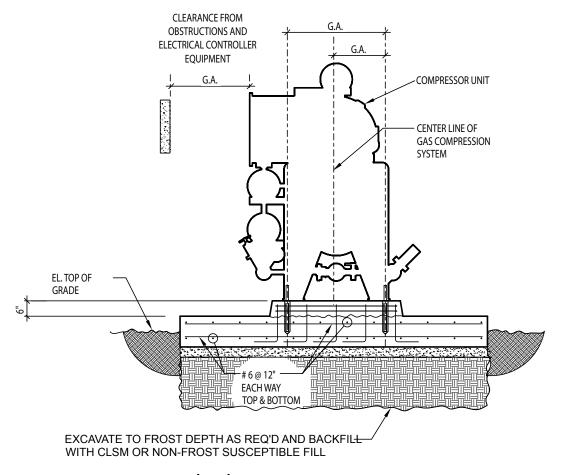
Concrete Pad with Compressor Unit Dimensions - Front View
